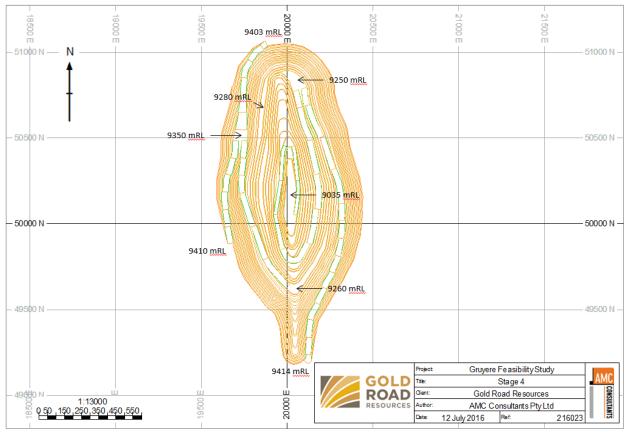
Plan View Showing Stage 4 of the Pit Design (Gruyere Grid)
